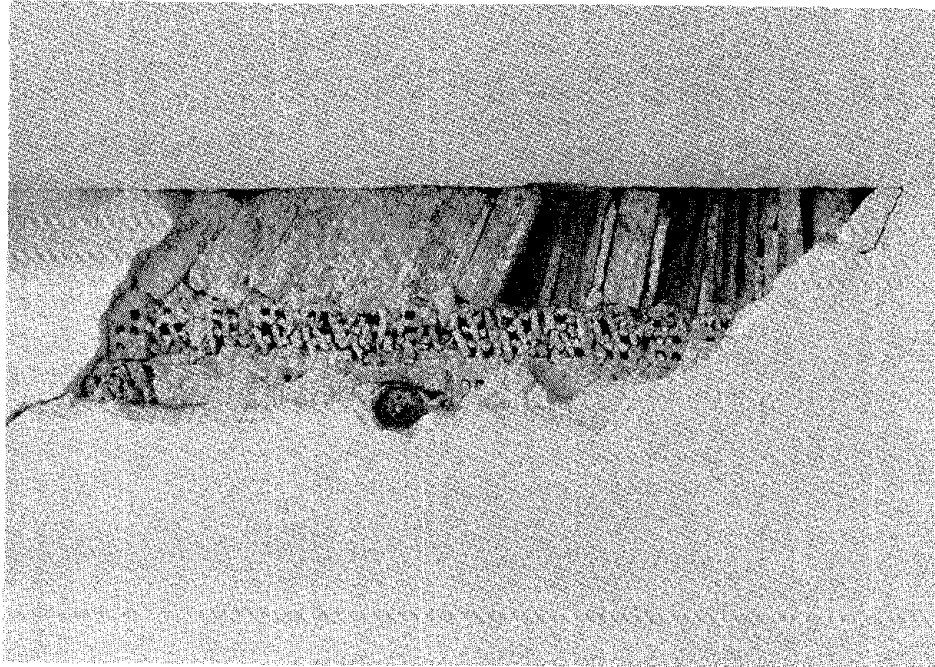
Detail of failure shown in Figure 4.11. Typical practice calls for the inclined bricks to be wedged under the ceiling beam. The underlying row of bricks are crushed.
